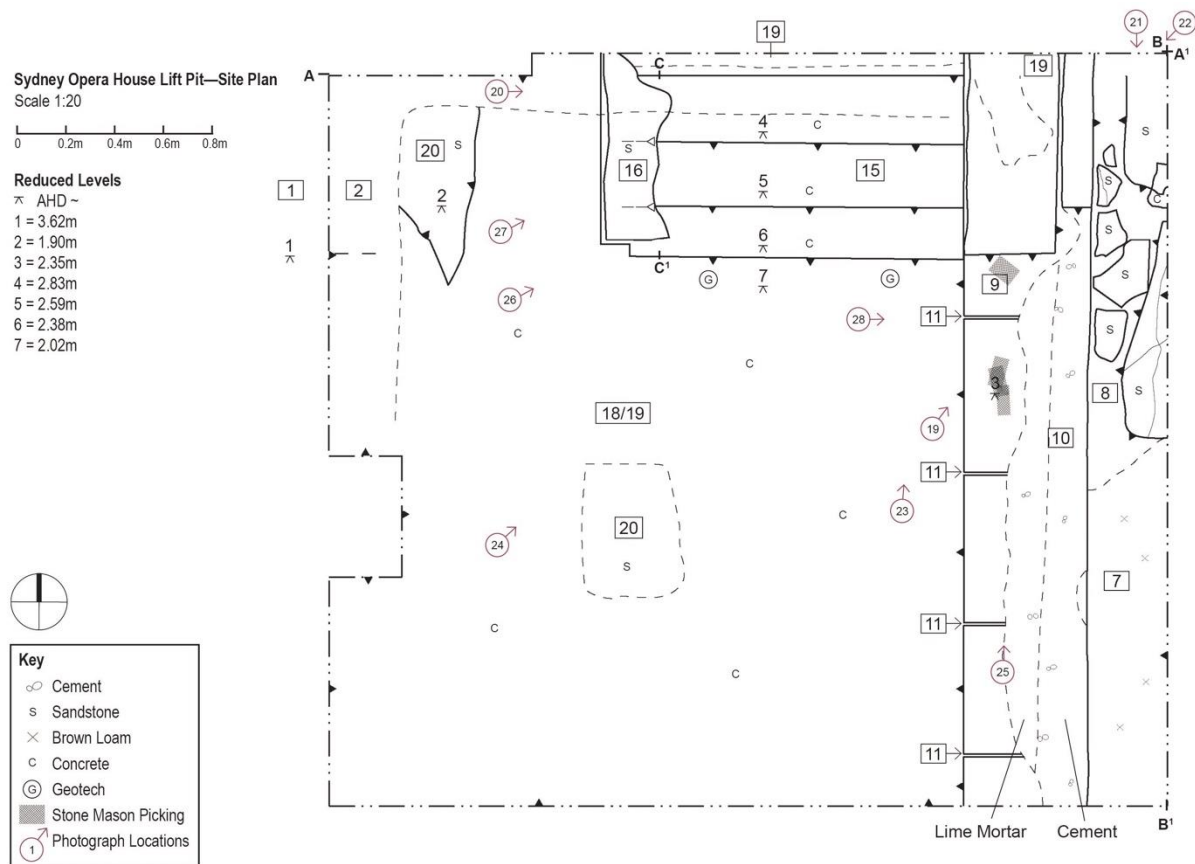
Photographic Plan Sheet, showing the extent of excavation following Phase 2. (Source: GML 2019)
